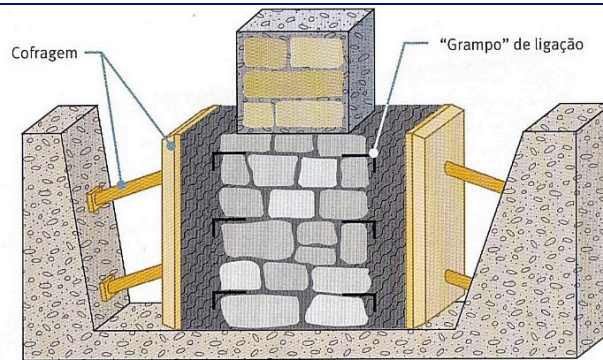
Enlargement of the foundation [Appleton, 2003]
